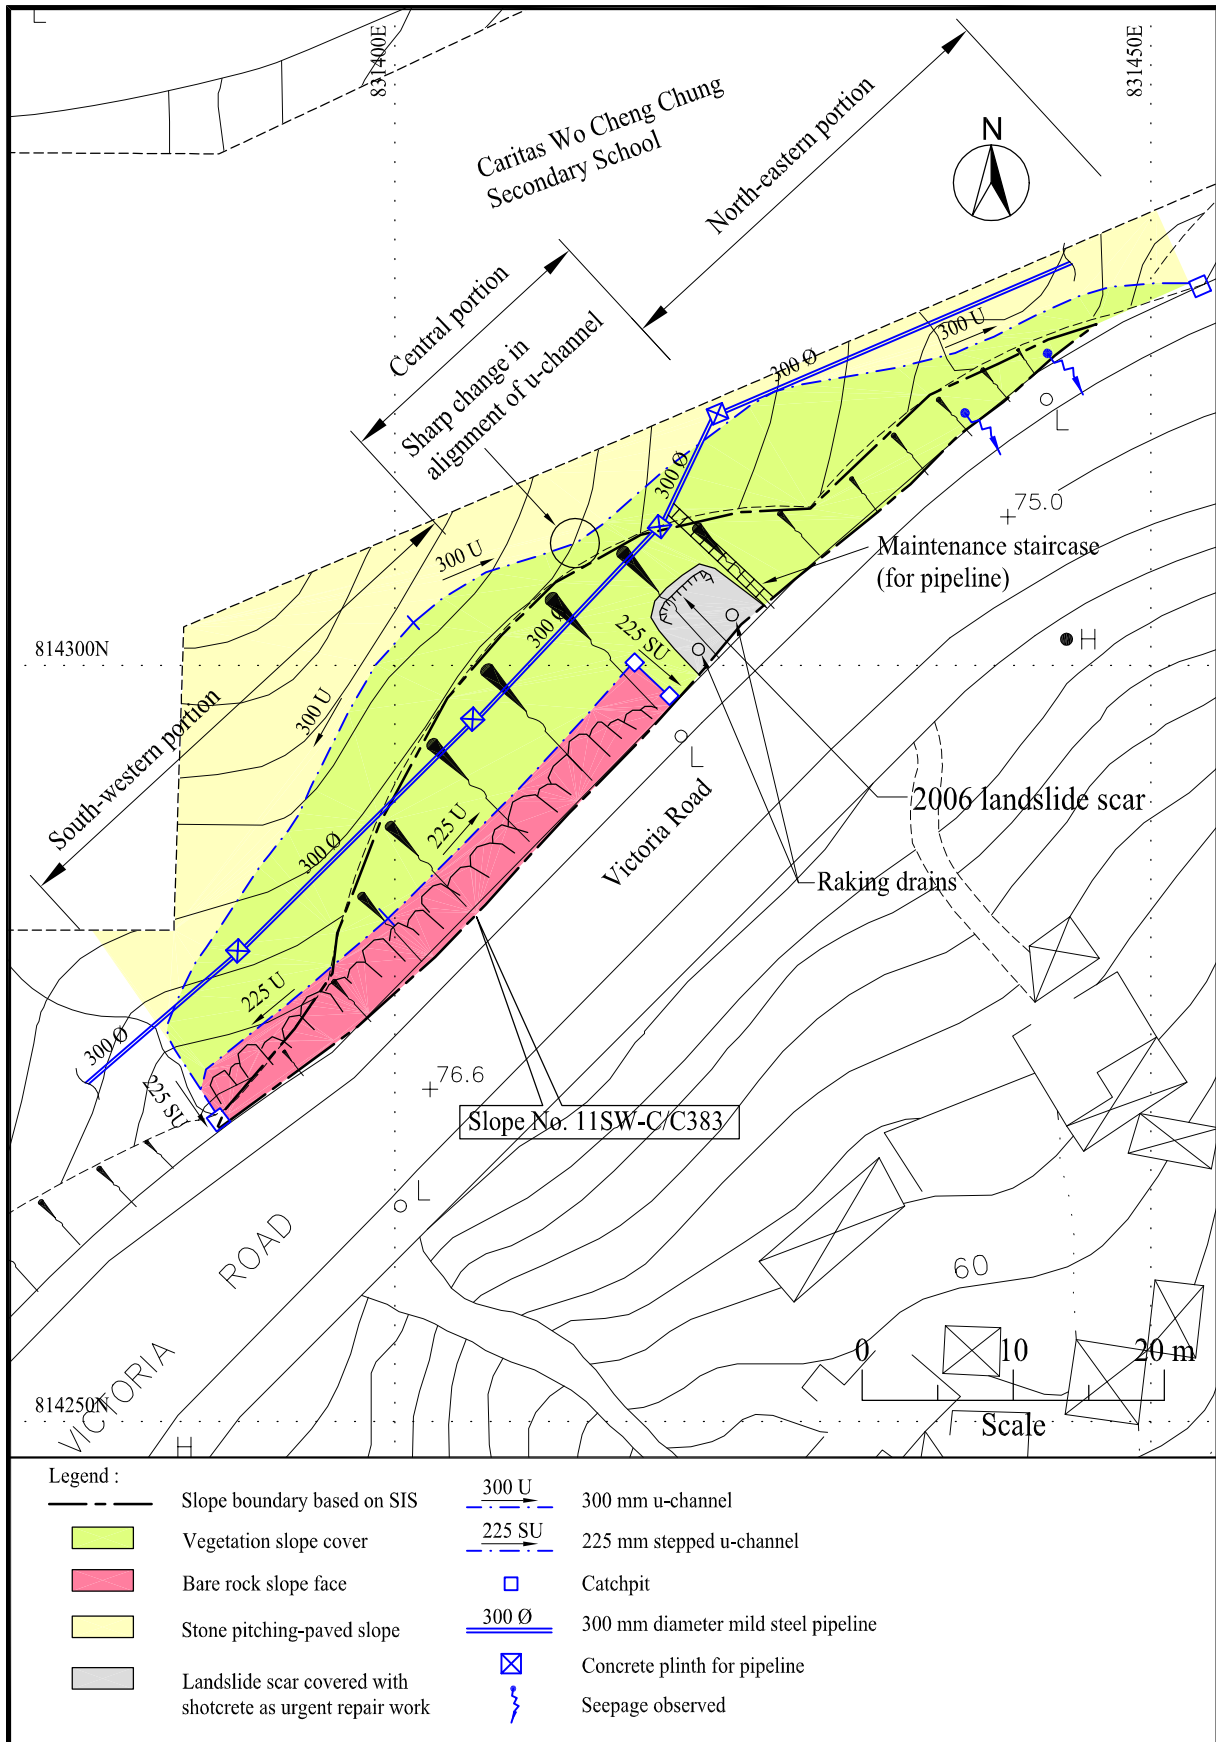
Site Plan and Field Observations (Slope No. 11SW-C/C383)
